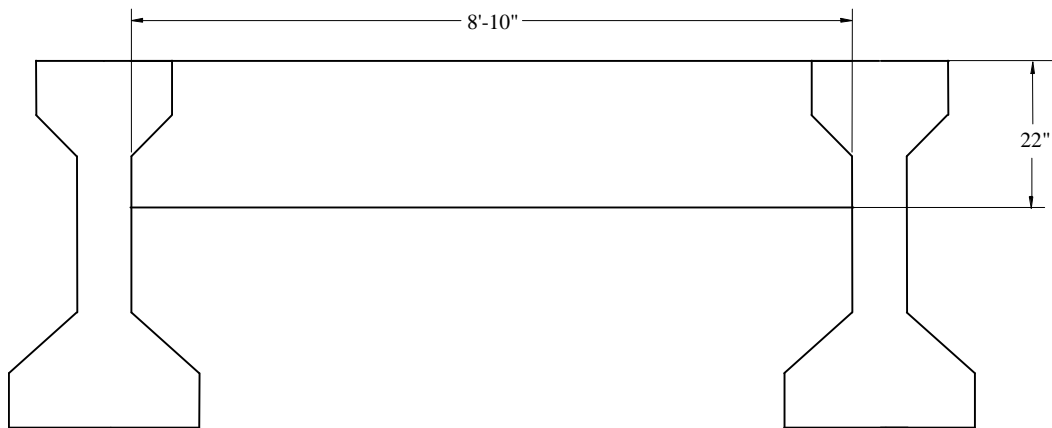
End Diaphragm Spanning Between Girders – Nolanville Bridge
